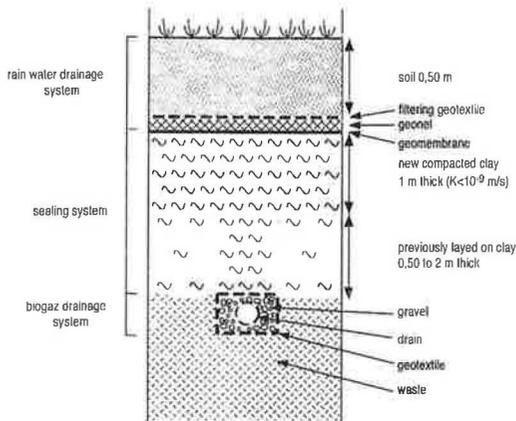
Menneville storage: Proposed capping system (schematic cross section)
